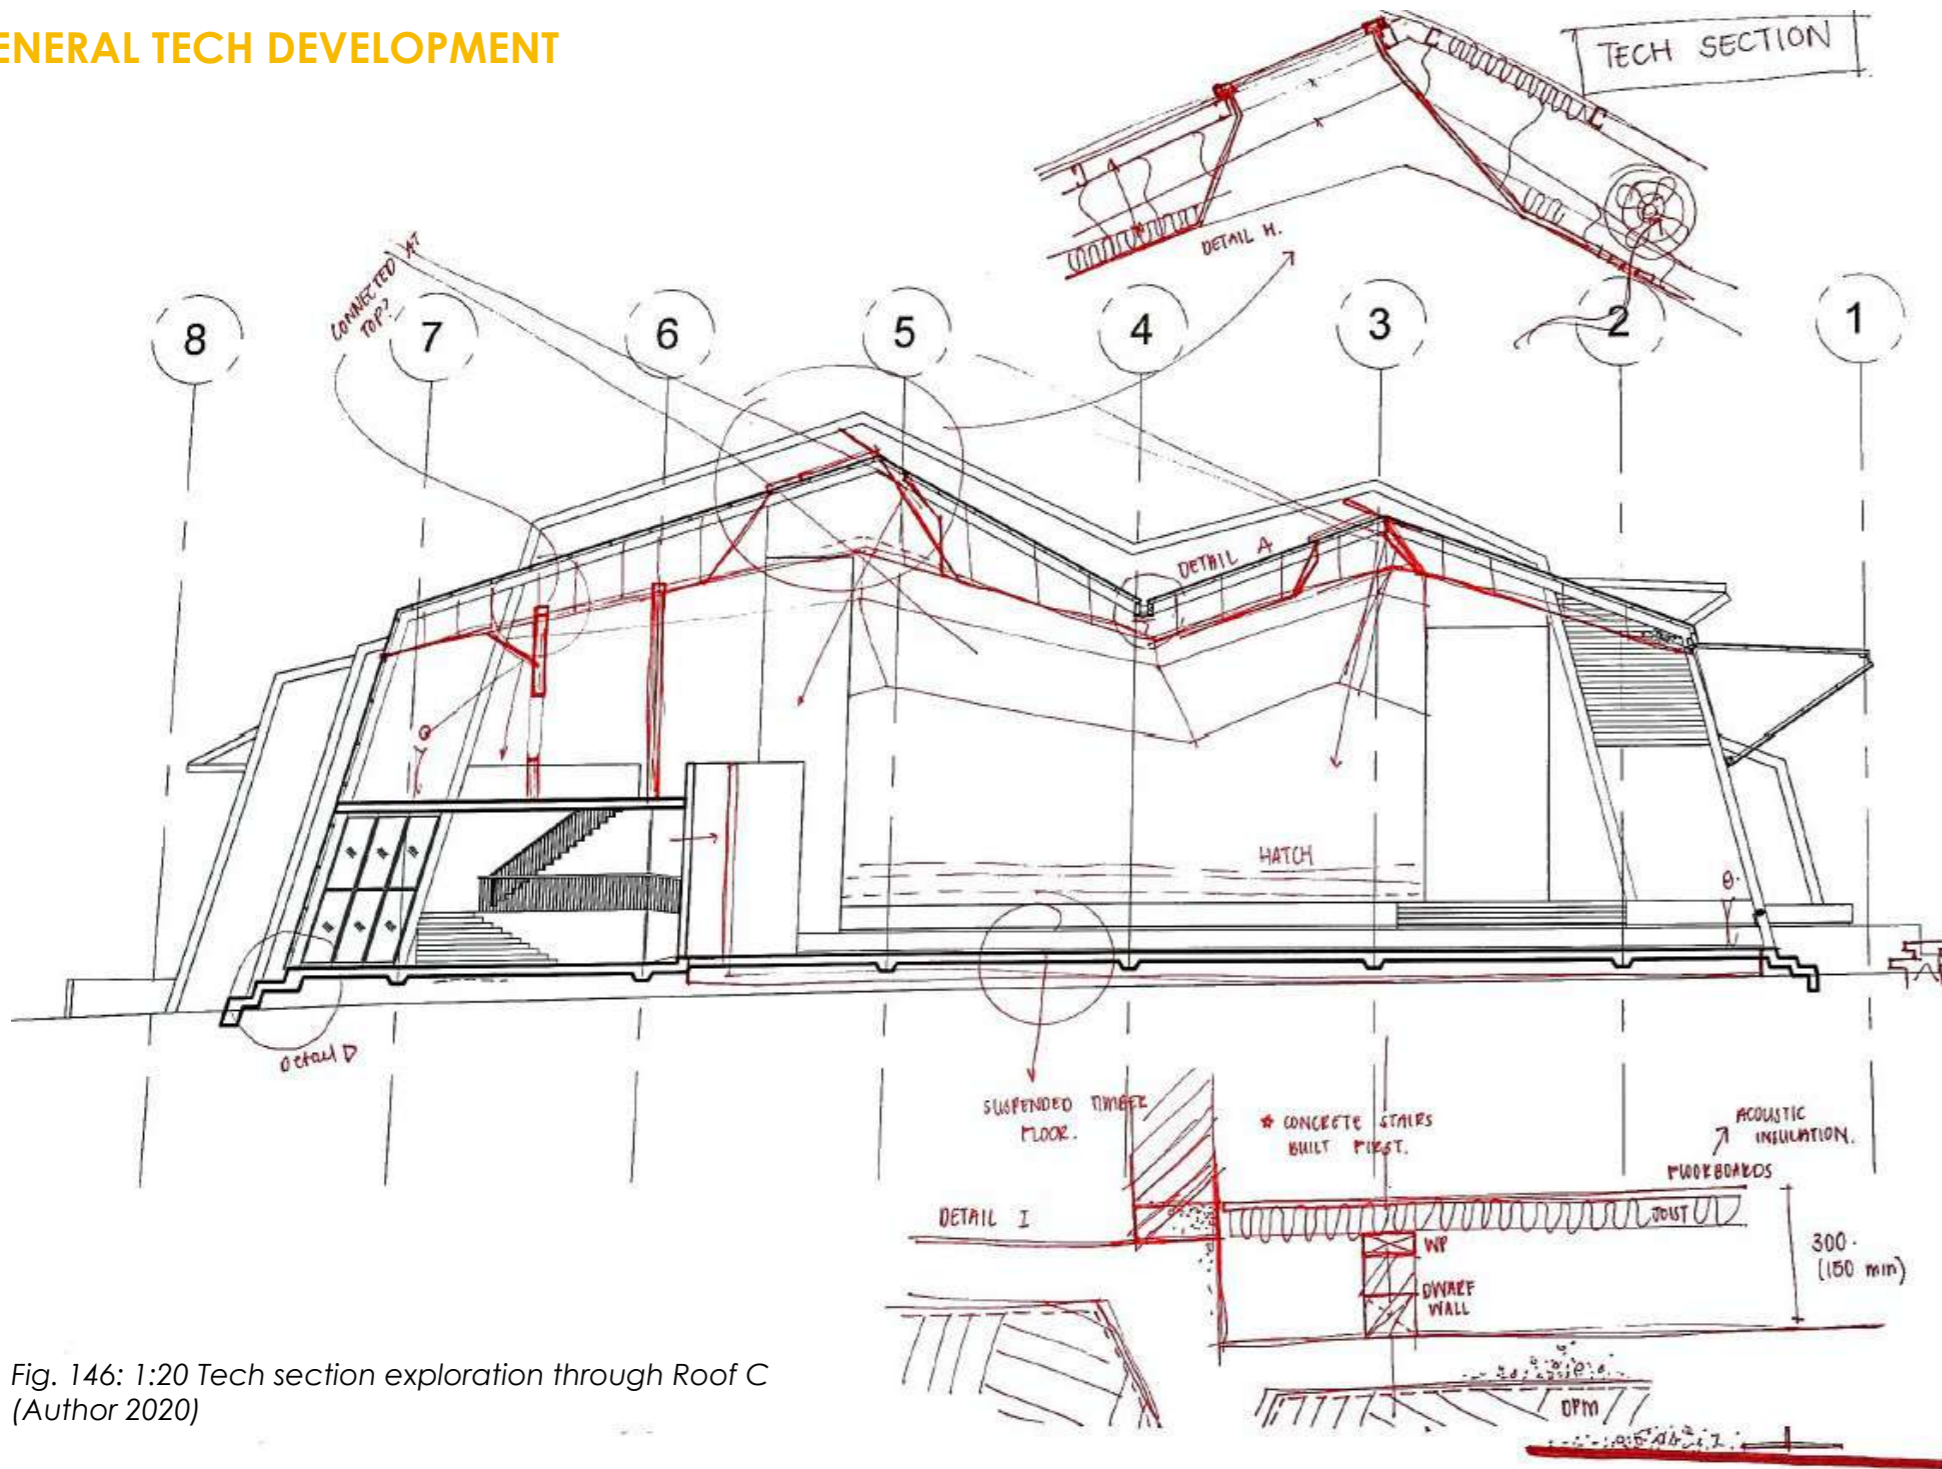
1:20 Tech section exploration through Roof C (Author 2020)
